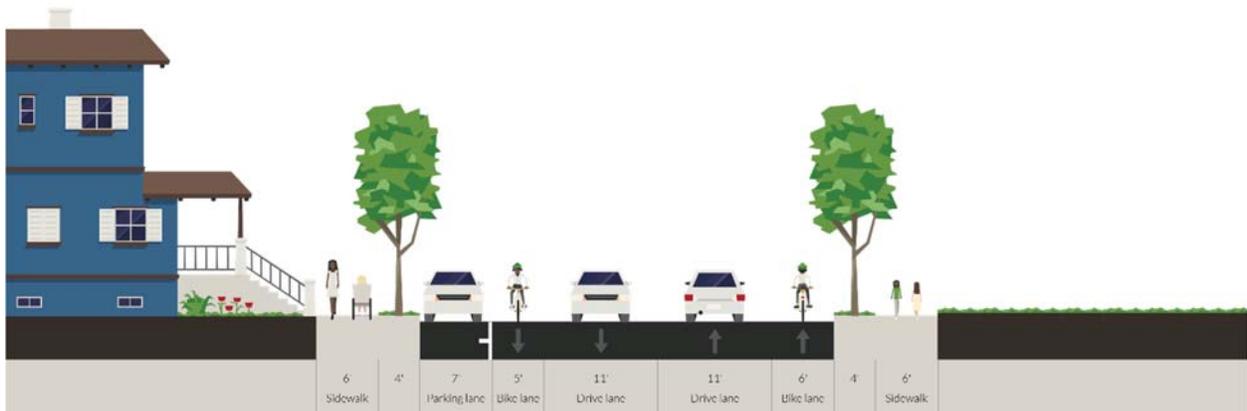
Major Collector - Typical Cross Section, Separated Bike Lanes (70-foot ROW)
